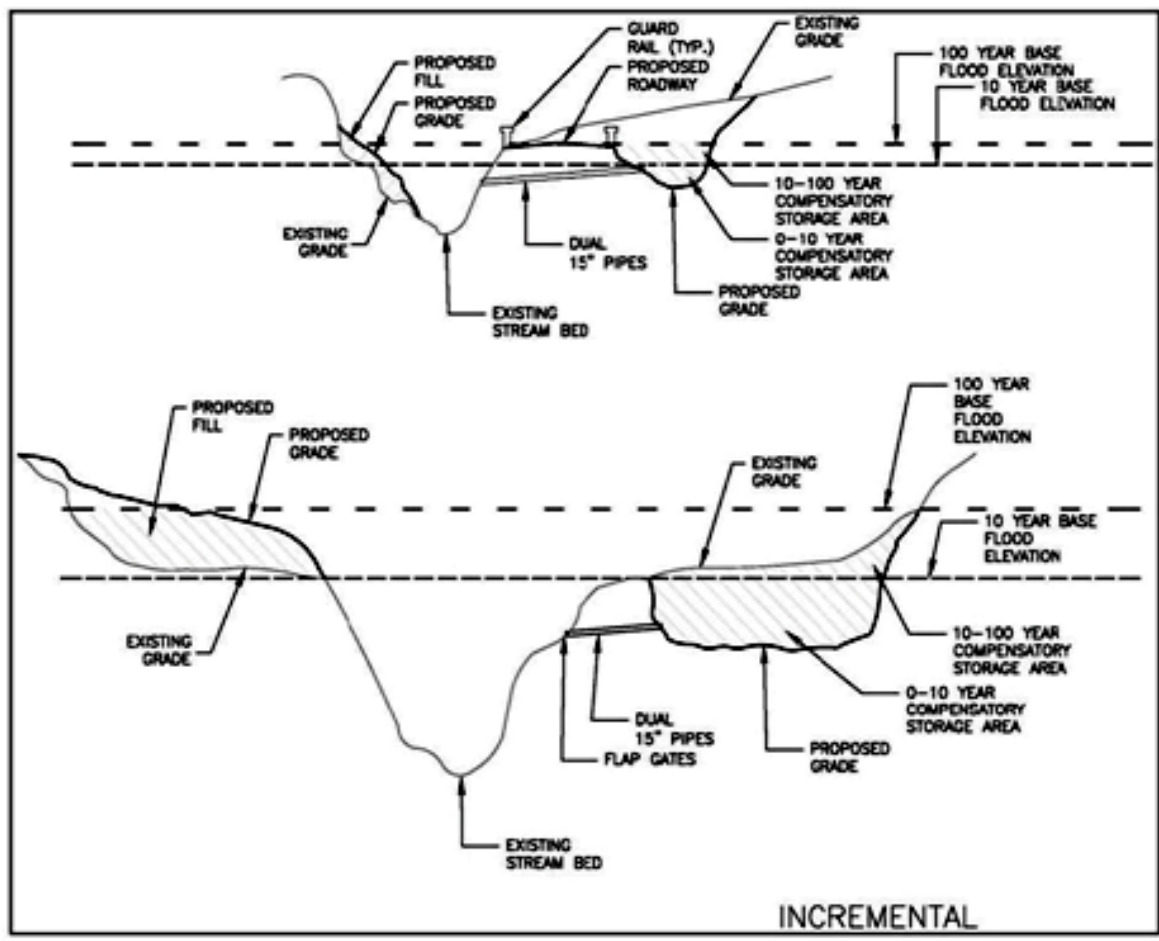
Example of Compensatory Storage Connection to Stream through Pipe
